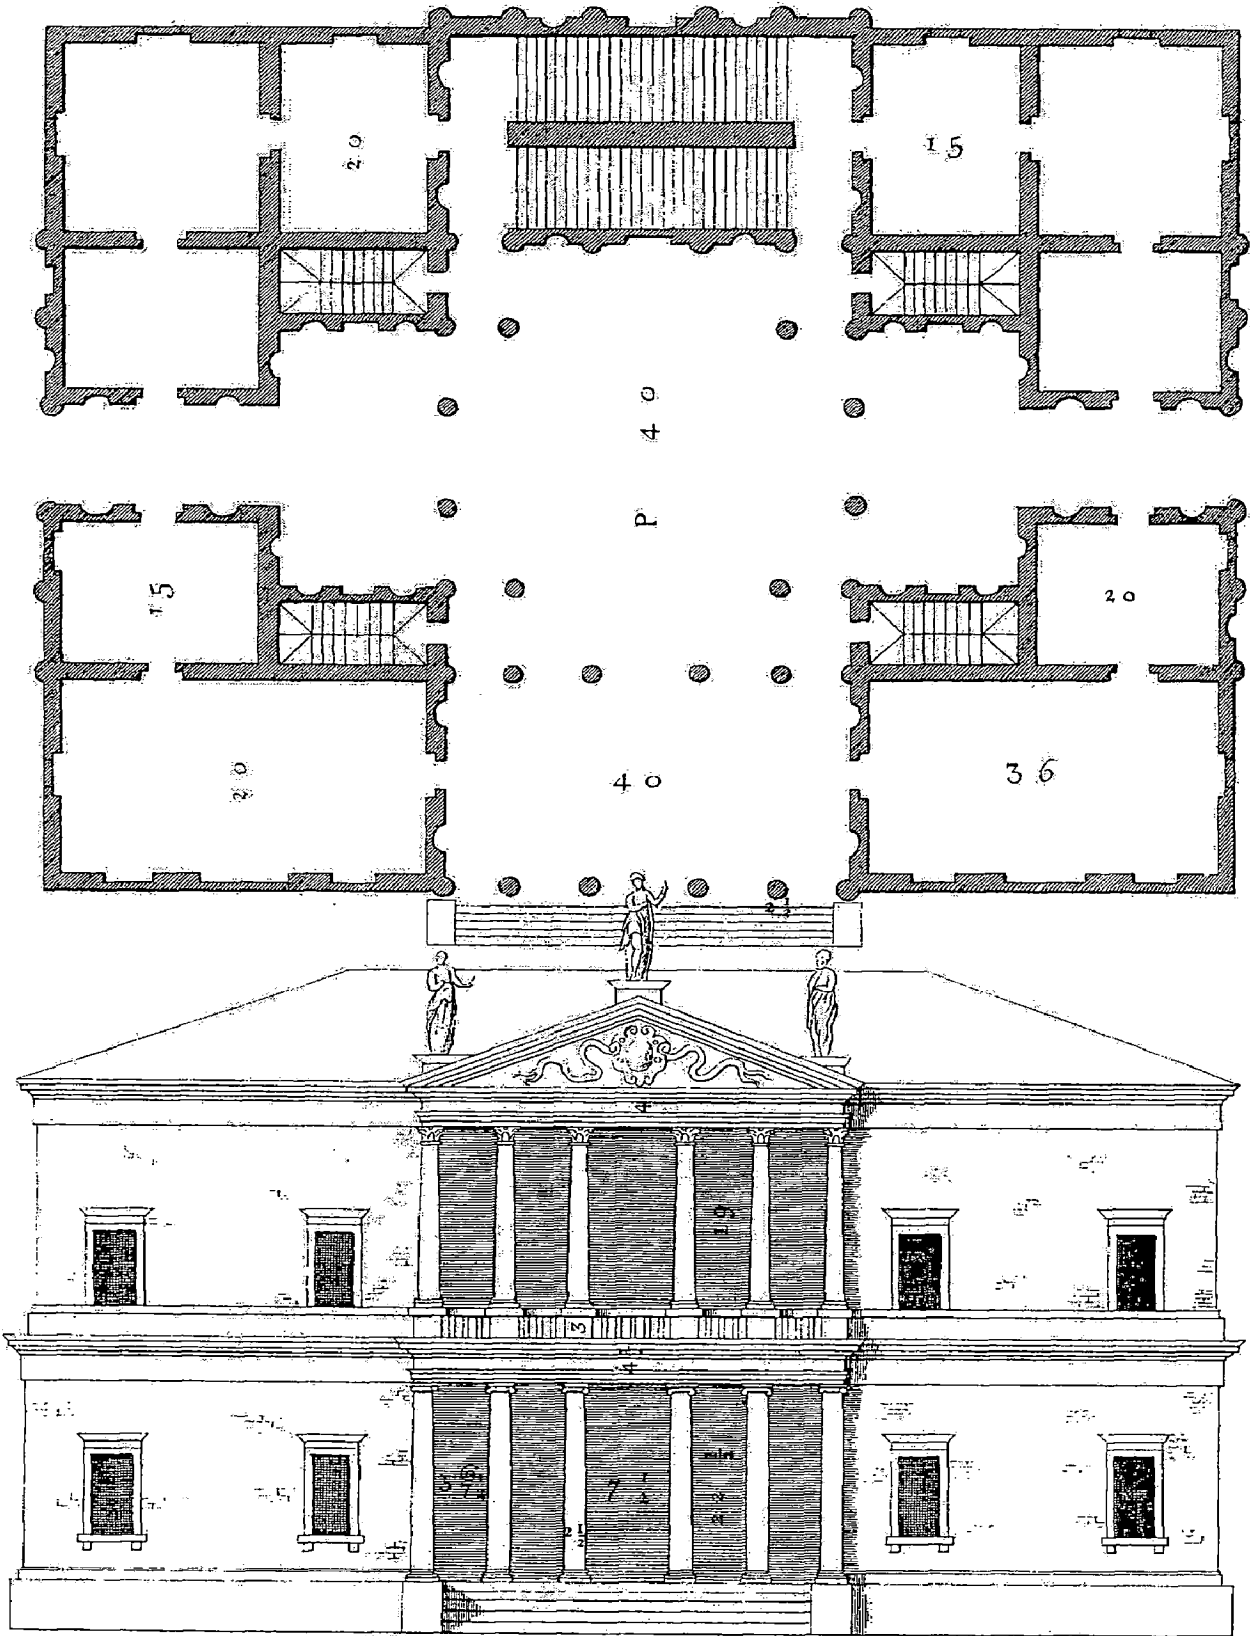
A project of Palazzo for Gio. Battista Della Torre in Verona in plan and elevation
